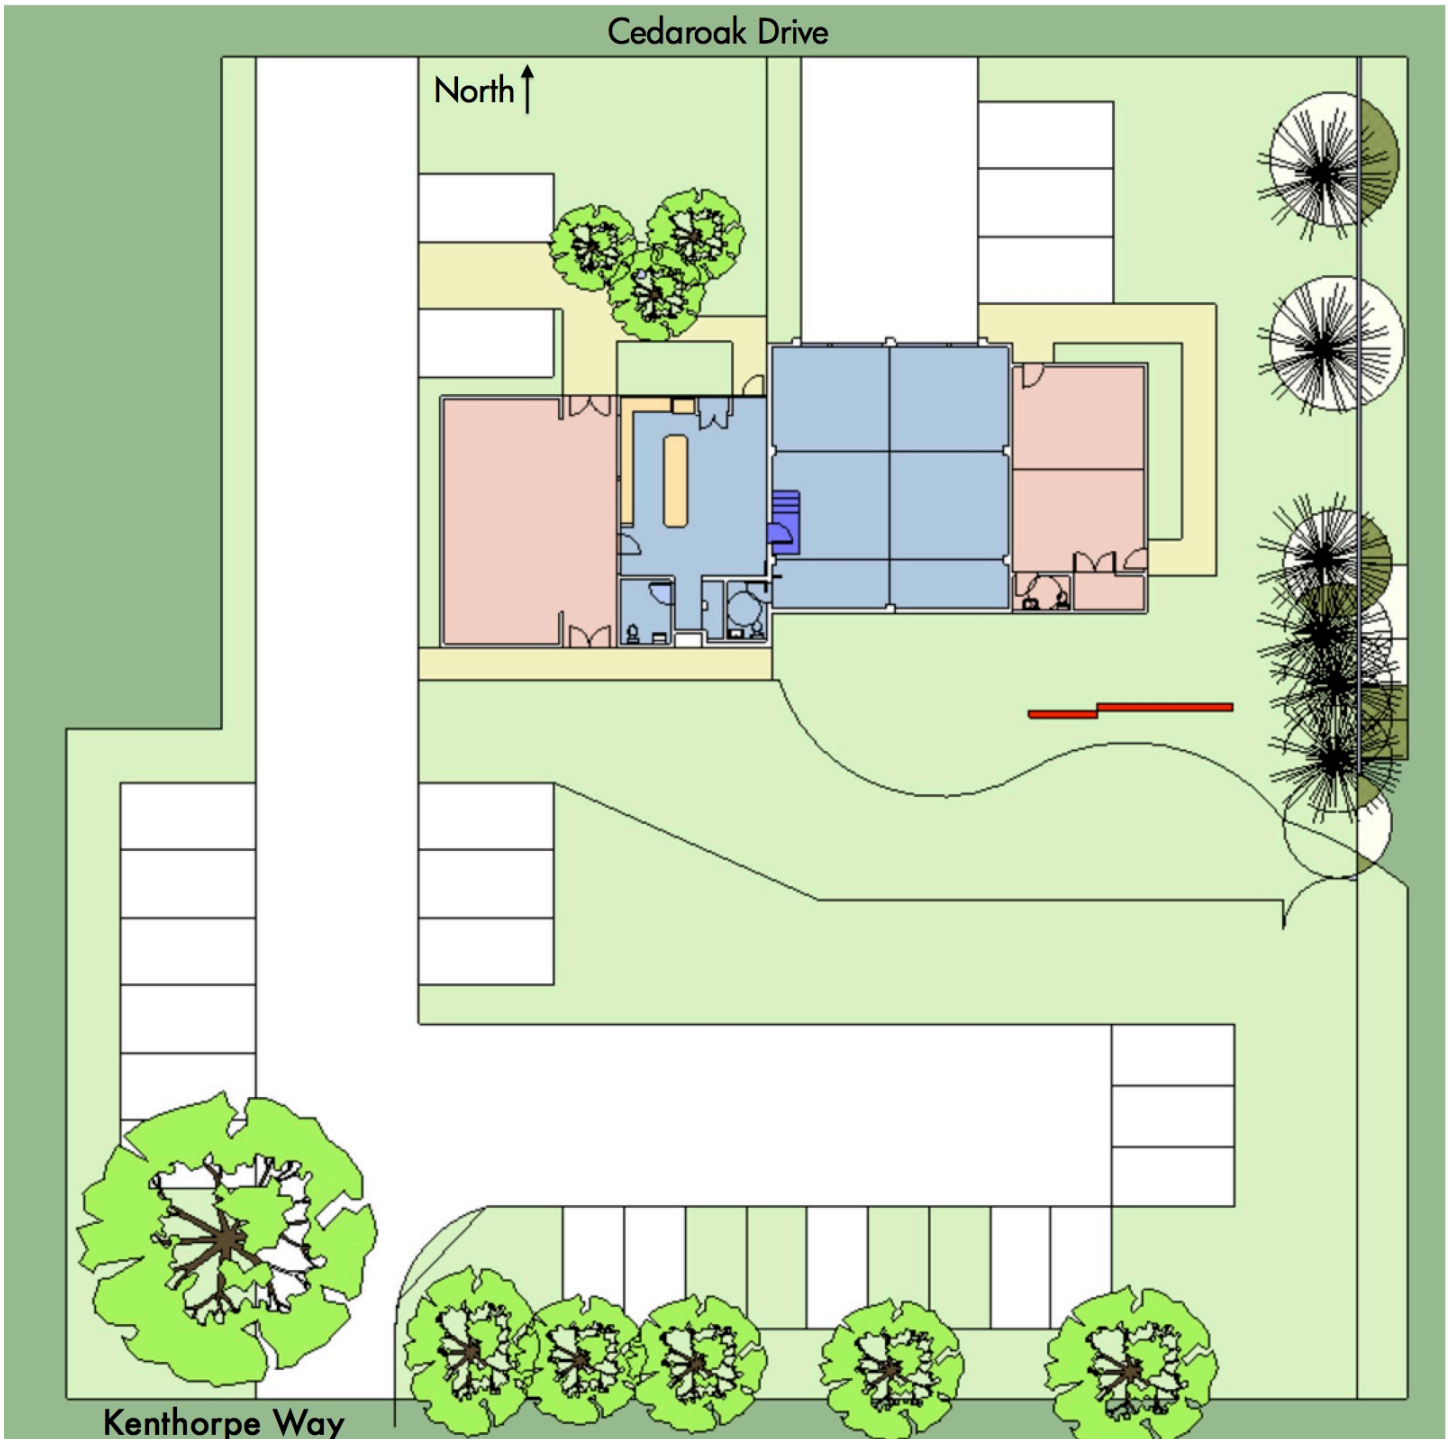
Concept for Robinwood Station site showing buildout of 3A, 3B and 4C with the Building 2 footprint used for garden and parking.
